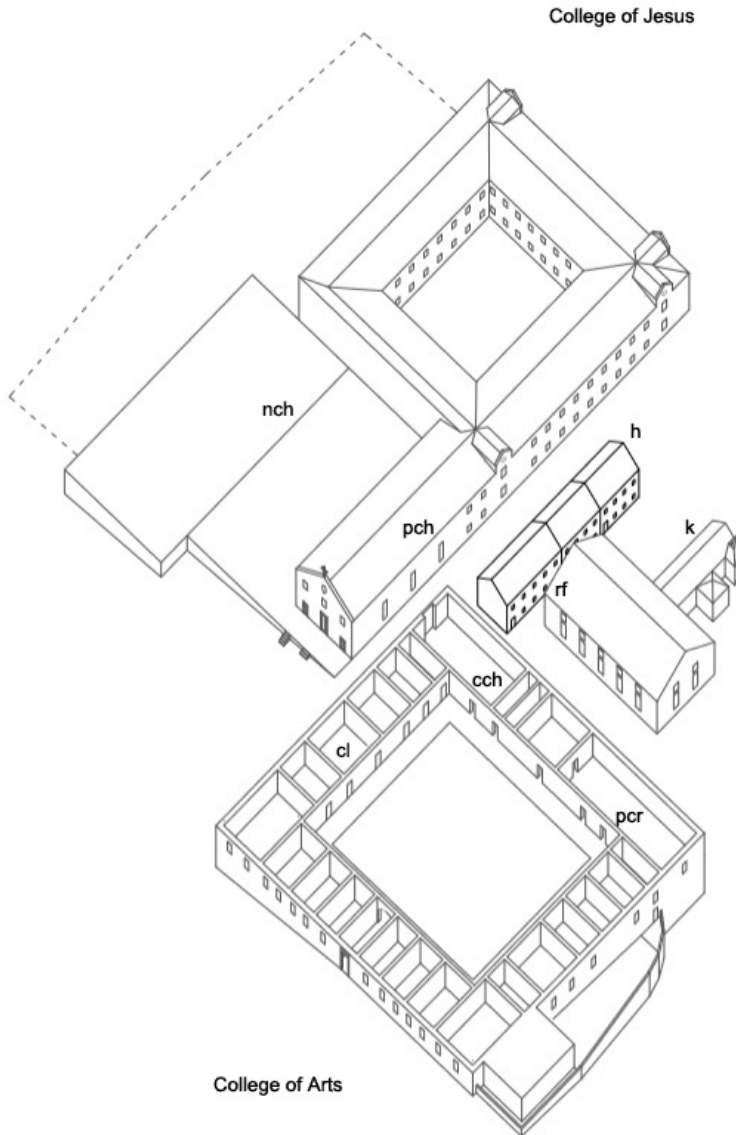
The Jesuit Colleges of Coimbra in 1617 (author's drawing): College of Jesus – pch: provisional church, nch: new church (in construction); h: S. Sebastião Street houses; rf: refectory; k: kitchen; College of Arts – cch: college chapel, pcr: public ceremonies room; cl: classrooms;
